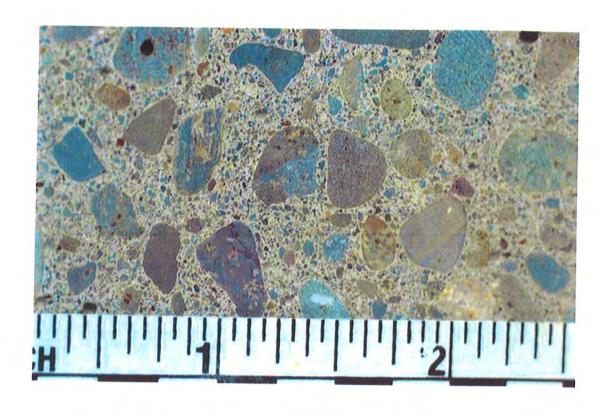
Closer view of sawed surface through Core 5CCA shows similar features.
